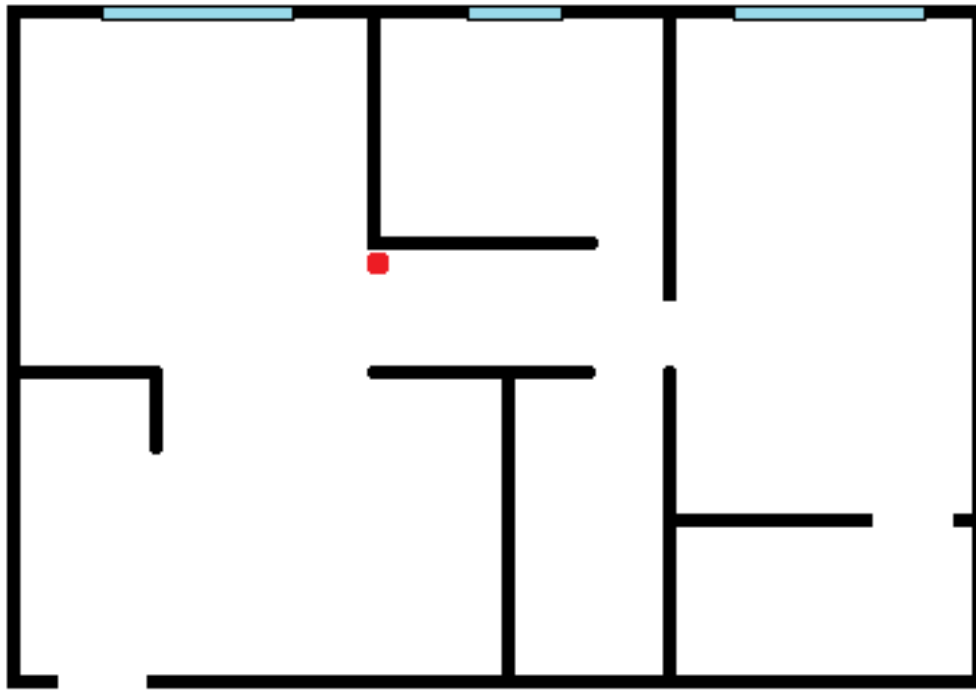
Floor plan of “typical” 900 square foot apartment, AP location in red
